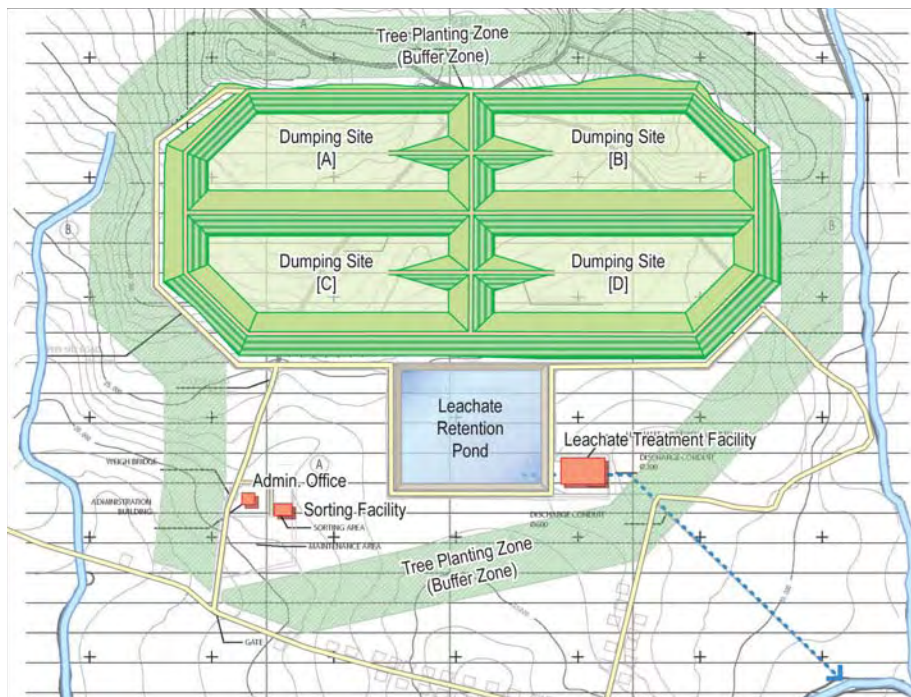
Layout Plan of Pattallassang Landfill Site
